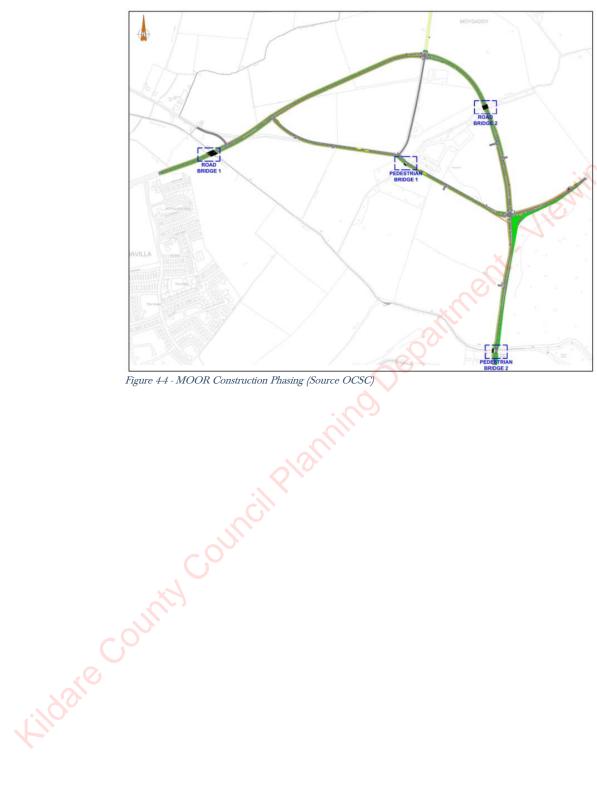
MOOR Construction Phasing (Source OCSC)
